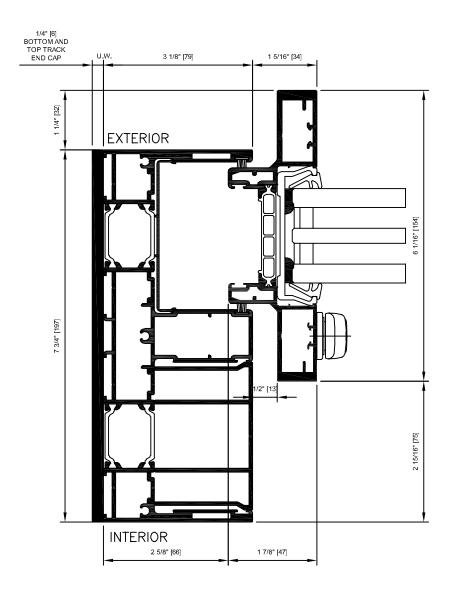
Side Jamb with Sliding Panel and Single Lock Stile with Handle
